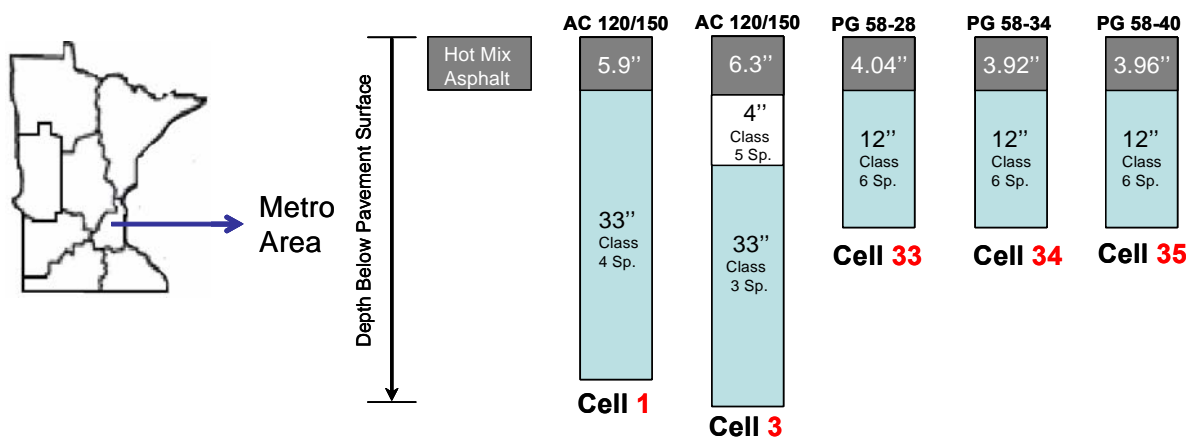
Pavement Layer Details for the MnRoad Cores.
